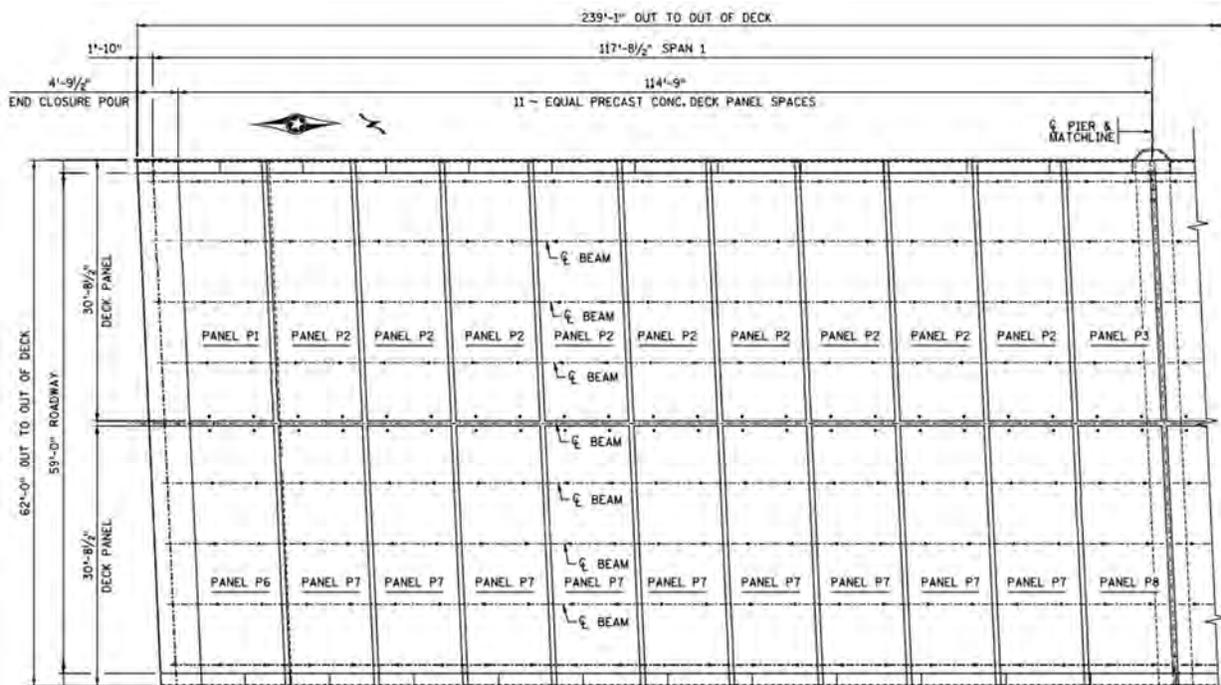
Partial deck plan showing panel layout in one of two spans.
